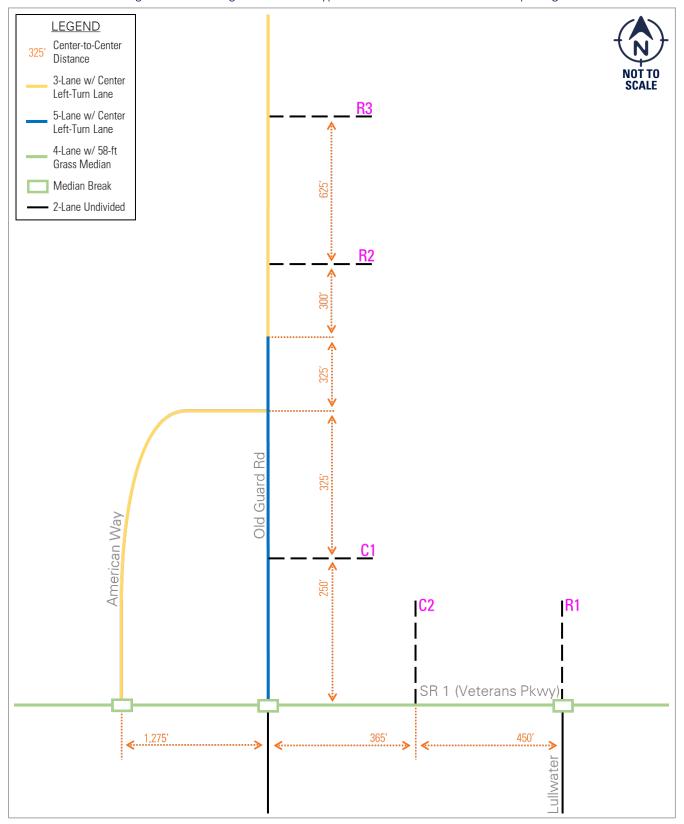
B: Existing Conditions - Traffic Control and Intersection Geometry
